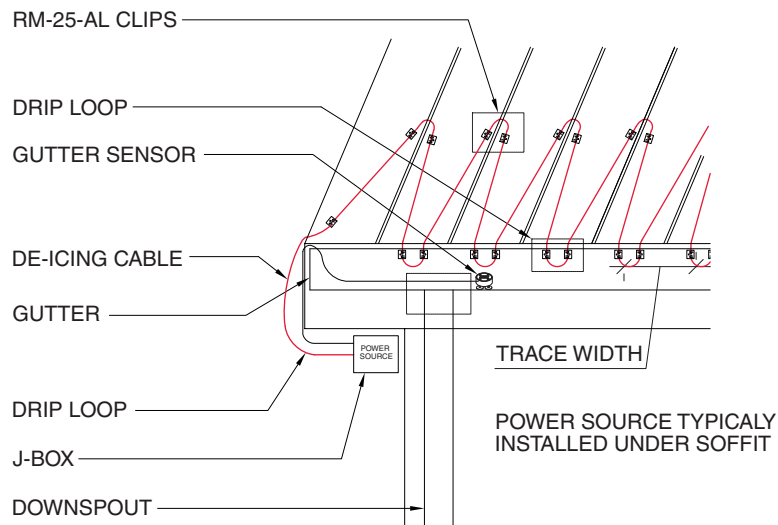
De-icing cable on sloped asphalt eave, inside of gutter, and in downspout. This layout typically uses DT-AS-50 clips with SB-190 adhesive on roof eave and RM-25-AL clips with VHB adhesive pads in gutter. Clip de-icing cable laying in gutter to bottom of gutter every 3'-5'. For copper gutters use RM-25-CU clips. Use DSH to hold de-icing cable at top of downspout.
